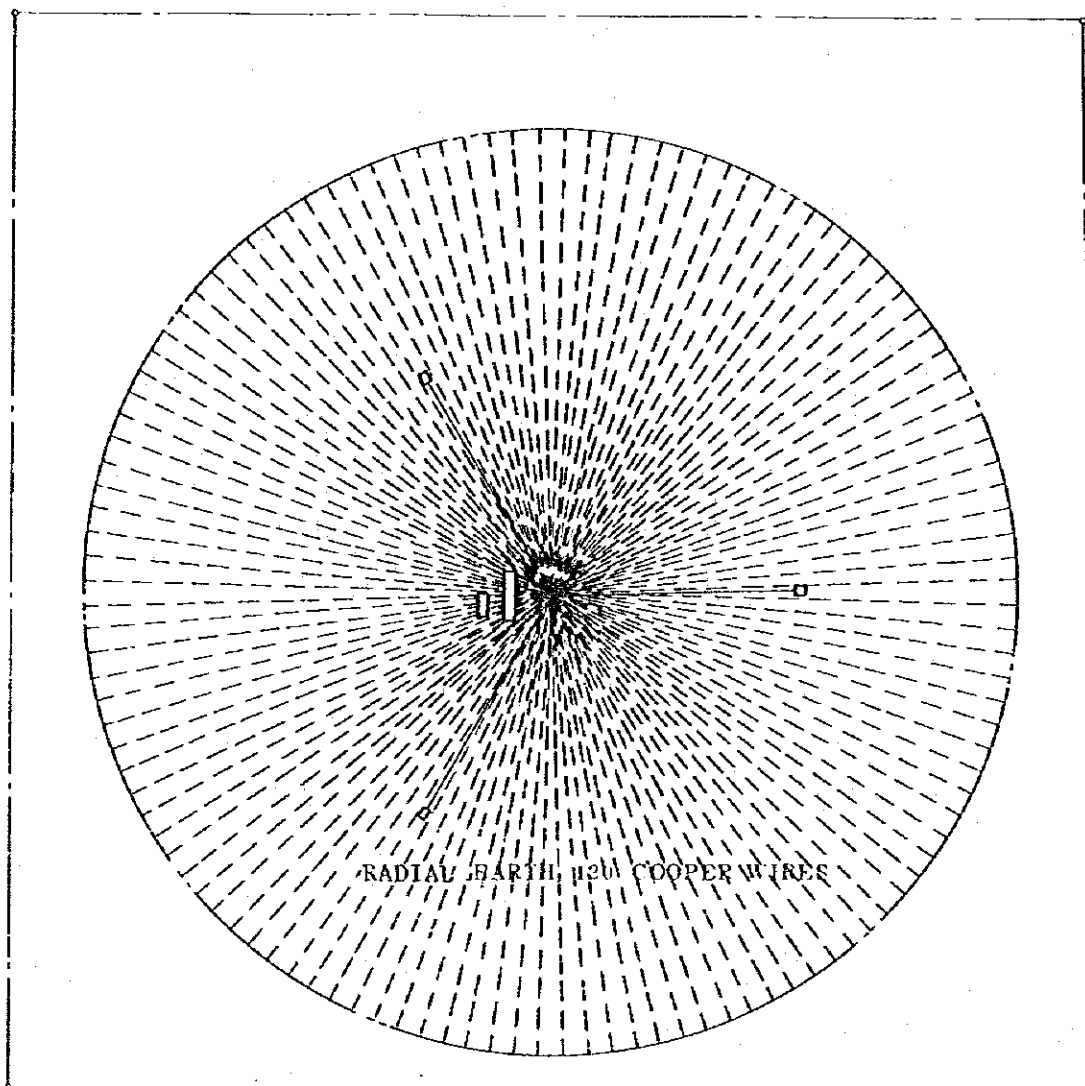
Layout of Tower and Earth of Kassala
